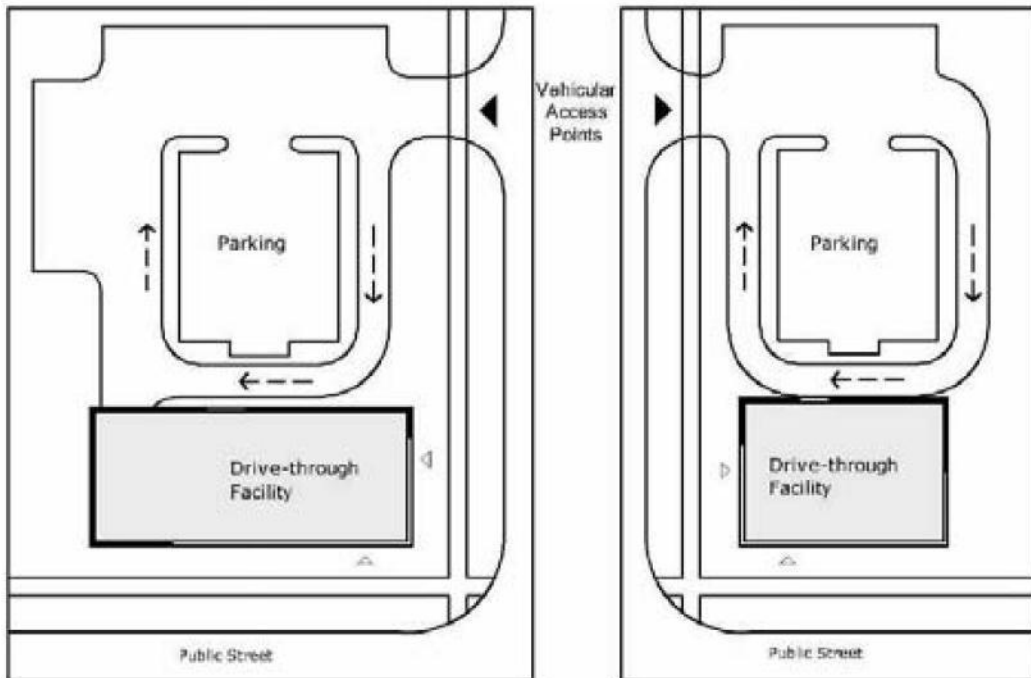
Example shows preferred design on a street corner; note the building is the prominent feature on the street corner with parking and drive-through lane secondary and behind the structures. Landscaping and screening berm/wall would obscure drive-through lanes that are parallel to the abutting secondary street.
